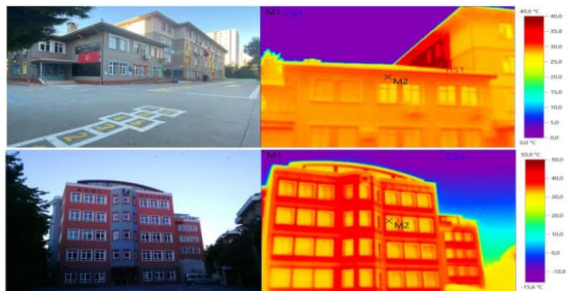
Thermal Exterior Photos of the Buildings (Building Type A on up and Building Type B presented below)
